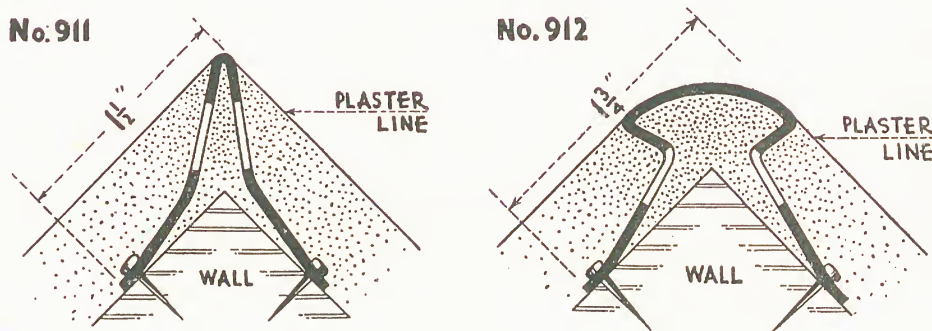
Steel corner angles. (Courtesy of Joseph Sankey & Sons, Ltd.)
